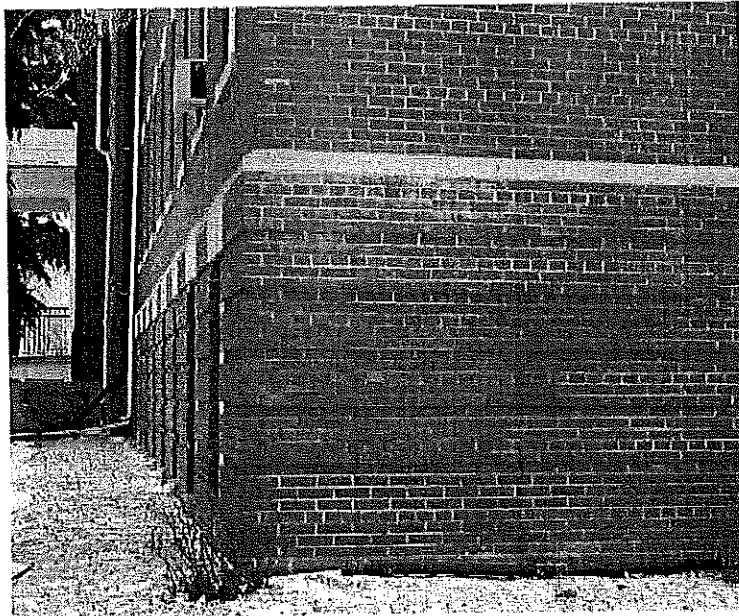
Rusticated brick masonry on the 1924 portion with sloped Tyndall Stone belt course
